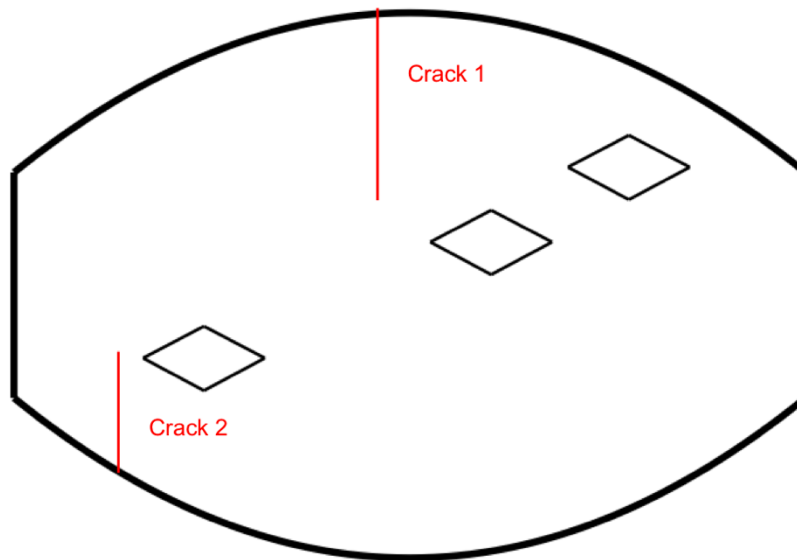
Approximate location of cracks on concrete shell.
